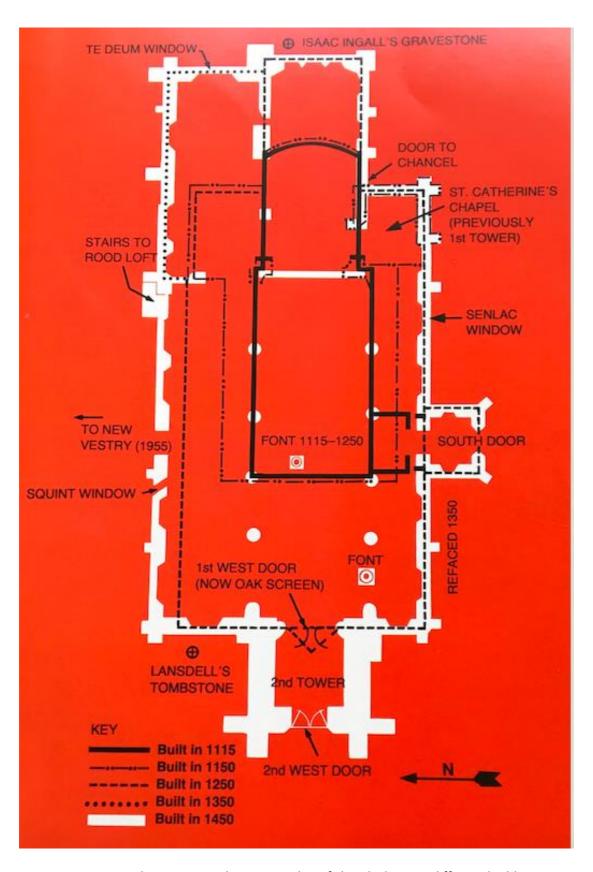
St Mary the Virgin, Battle, Sussex: plan of church showing different building campaigns. (From the parish church guidebook, (undated), p. 8.)
